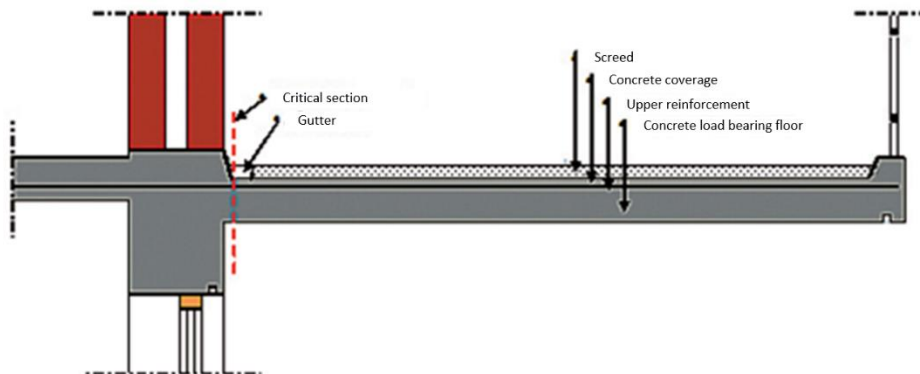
Monolithically connected cantilevering floor (De Jonker et al., 2014)
